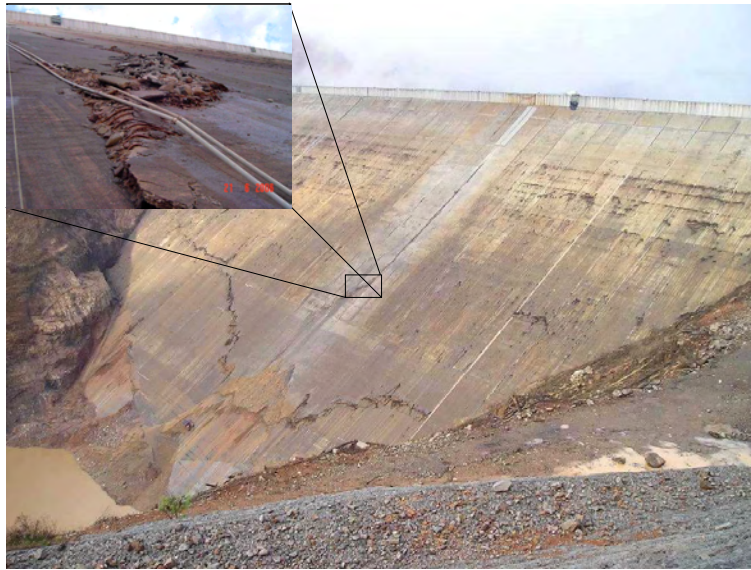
Failure of concrete slabs in Campos Novos rockfill dam, after Pritchard (2008).
